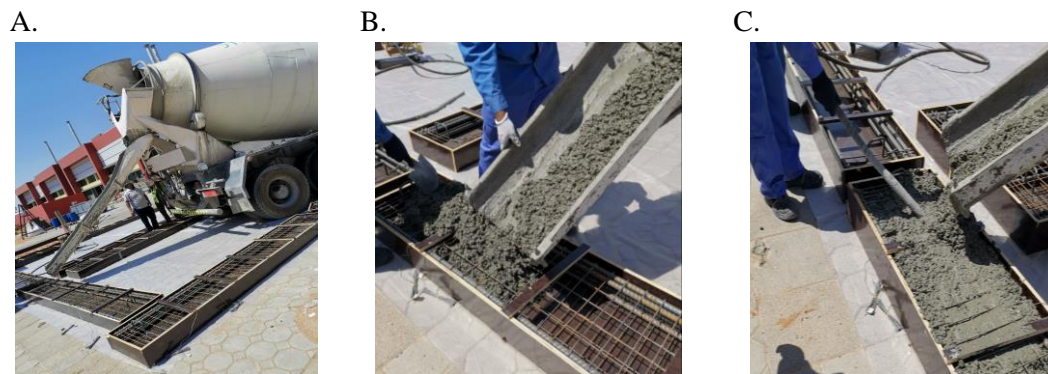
Concrete casting: A. Ready-mix concrete truck, B. Placement of concrete, C. Vibration of concrete
